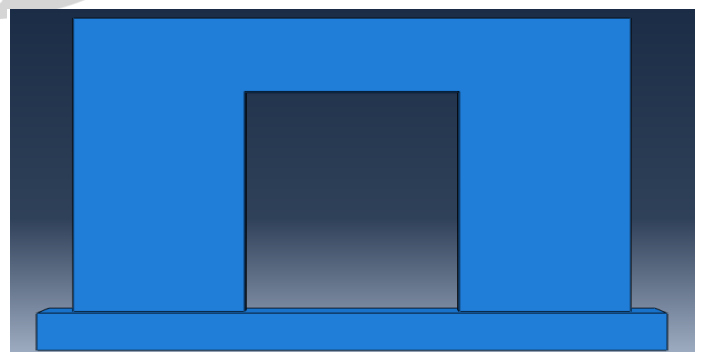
Model 4 Shear wall with size of opening 3 m x 2 m
